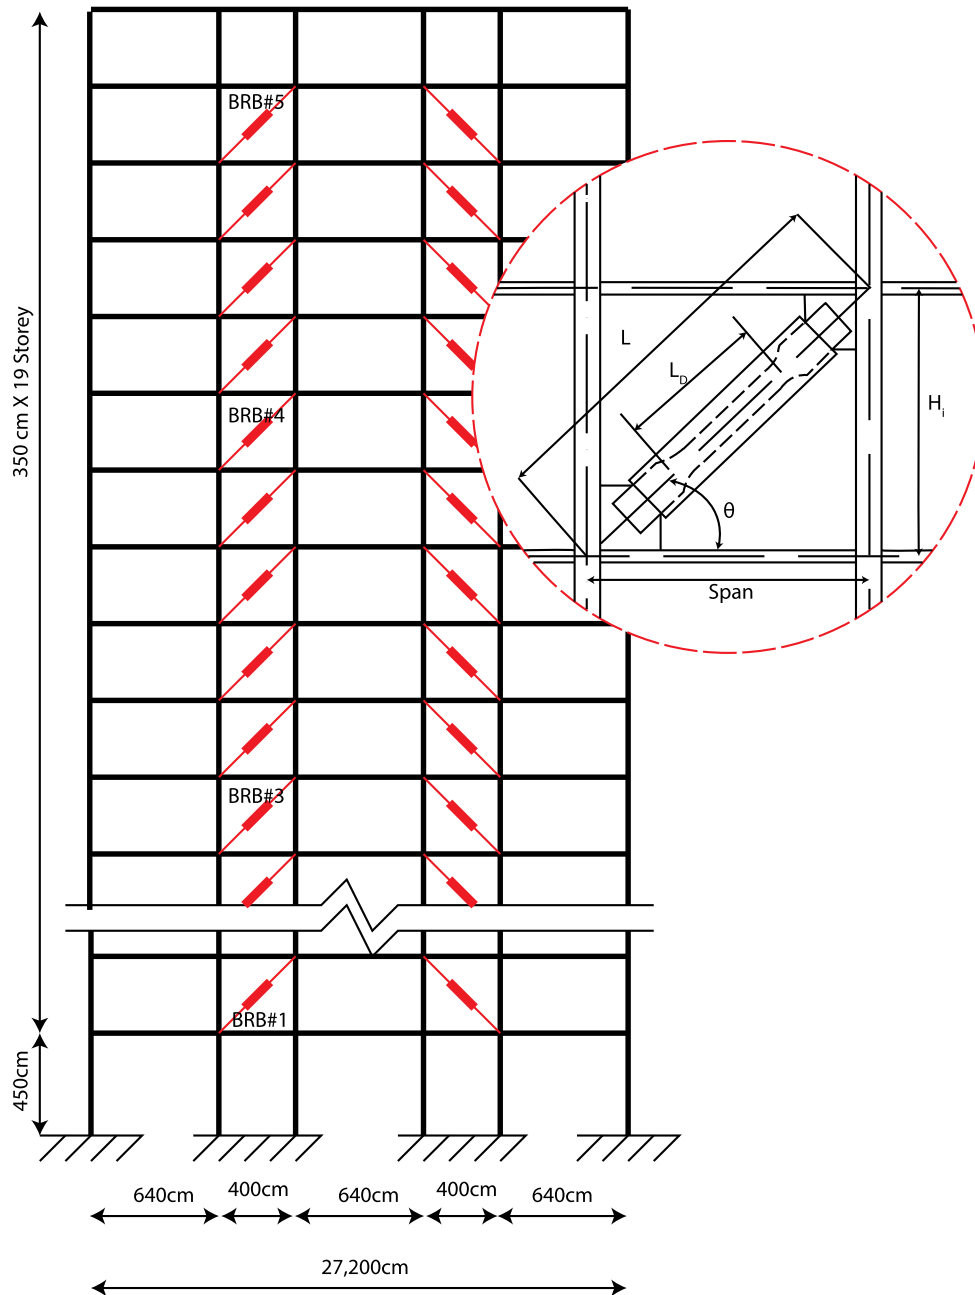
20-story steel prototype building elevation and BRB configuration.
